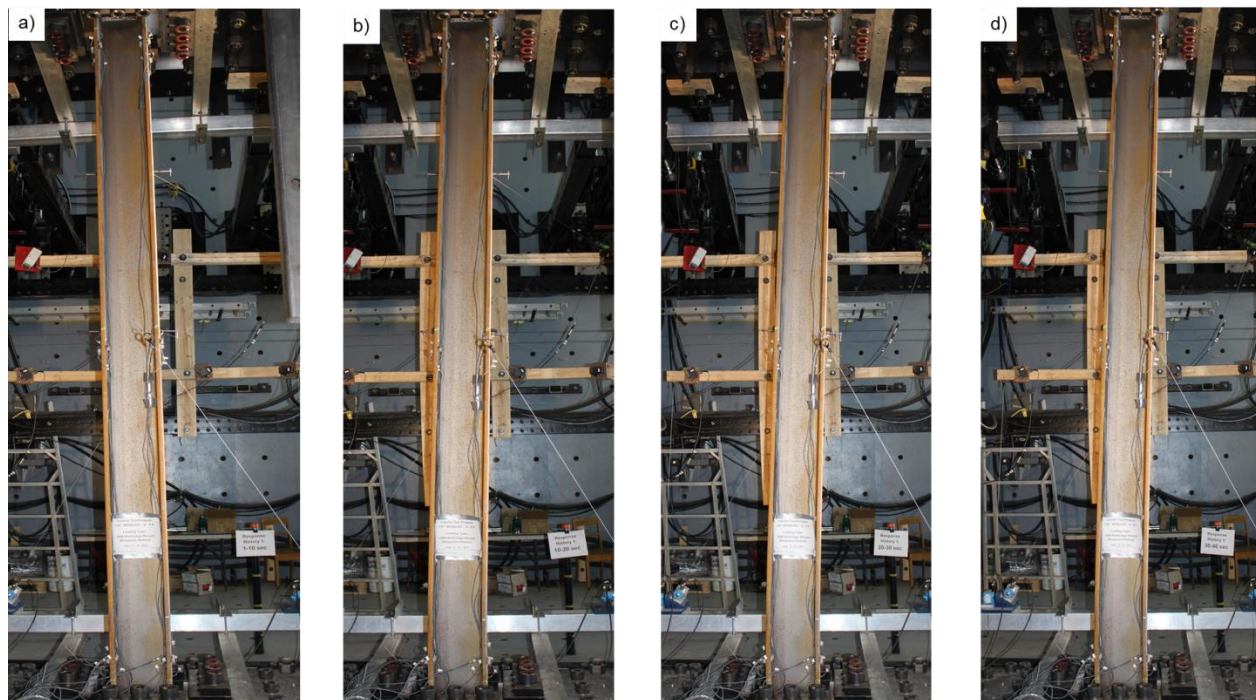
Deformed shape of specimen CS7 under the first imposed ground motion at a) 1-10 sec; b) 10-20 sec; c) 20-30 sec; and d) 30-40 sec.
